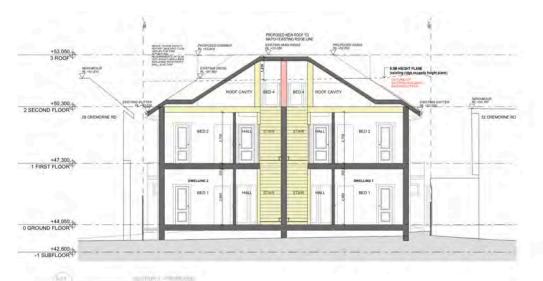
Figure B – Western elevation indicating the extent of the maximum height departure to the main roof over the attic to the rear (western) side of the building
